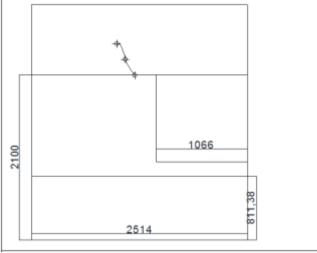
Crack profile for Kitchen wall 2 (Block B)
